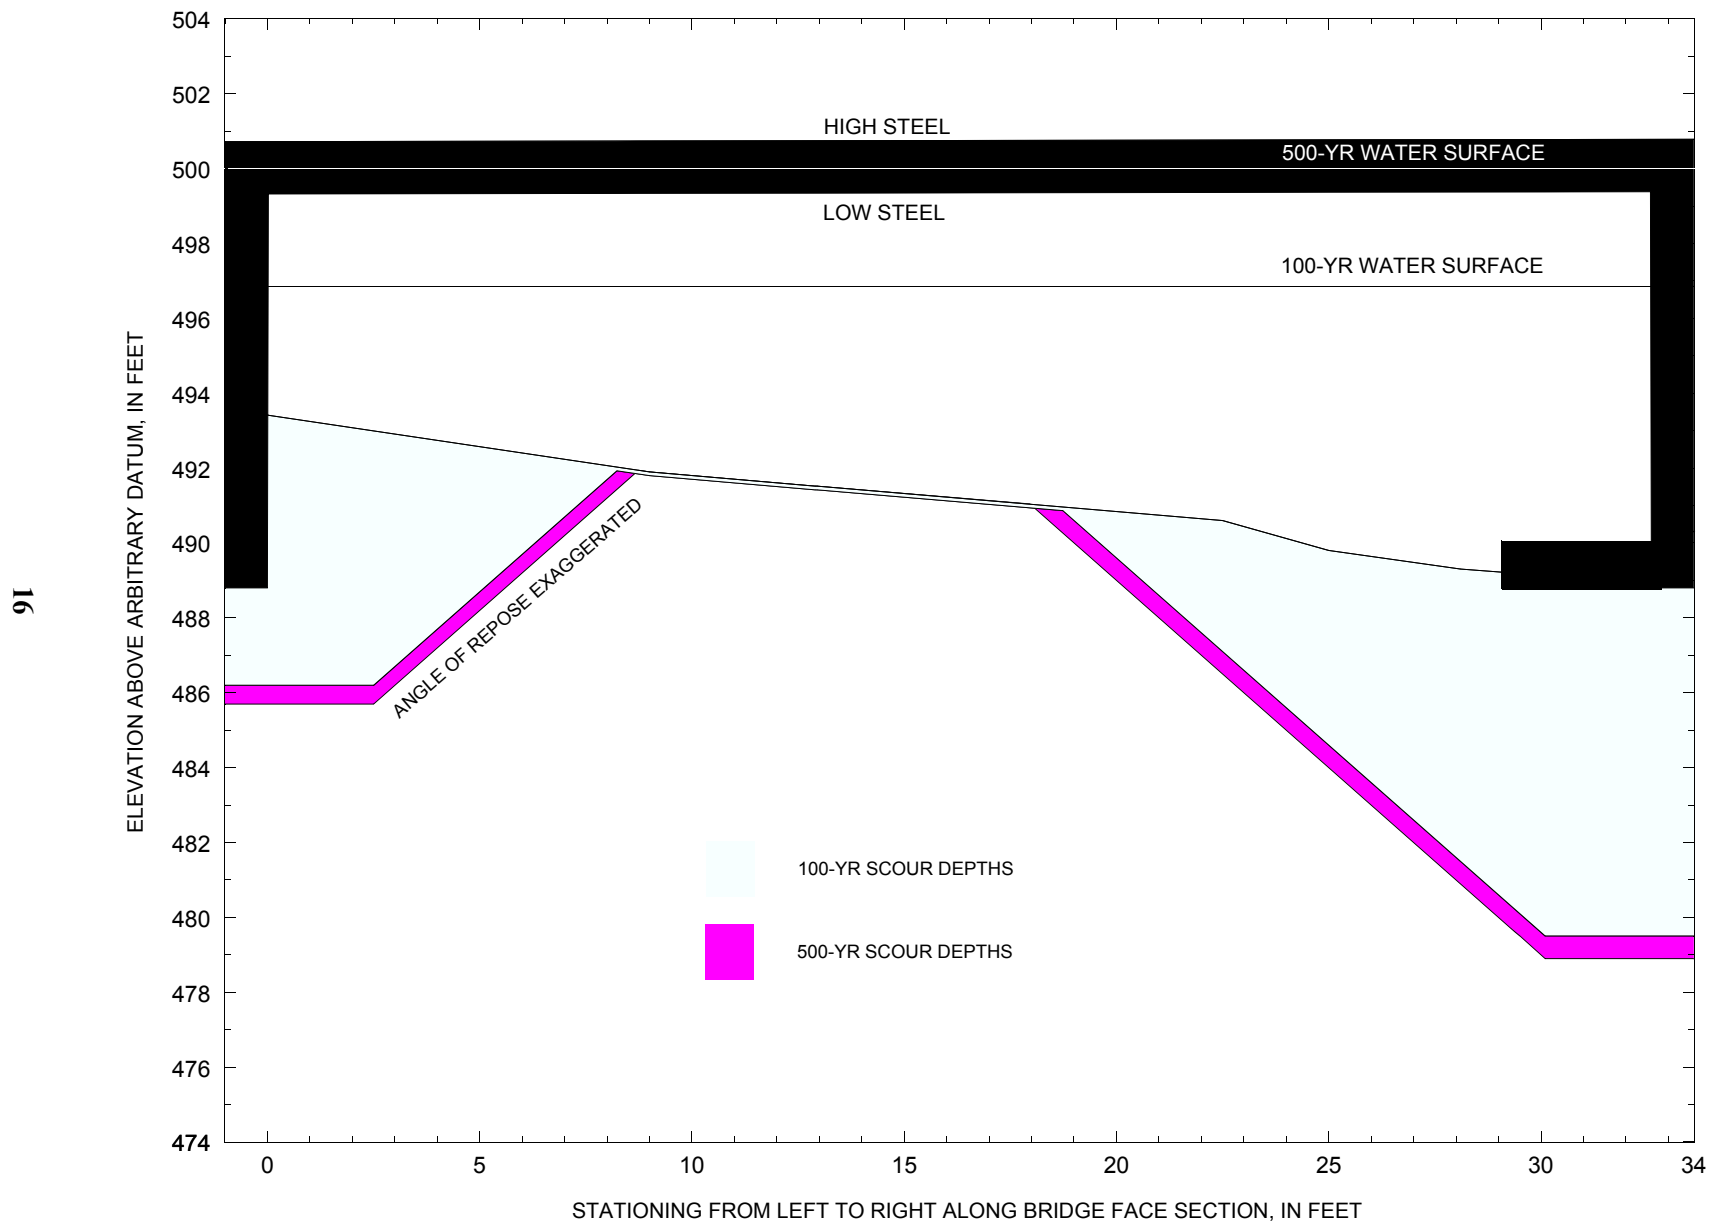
Scour elevations for the 100-yr discharge at structure [BETHTH00230040](#) on town highway 23, crossing [Gilead Brook, Bethel, Vermont](#).
